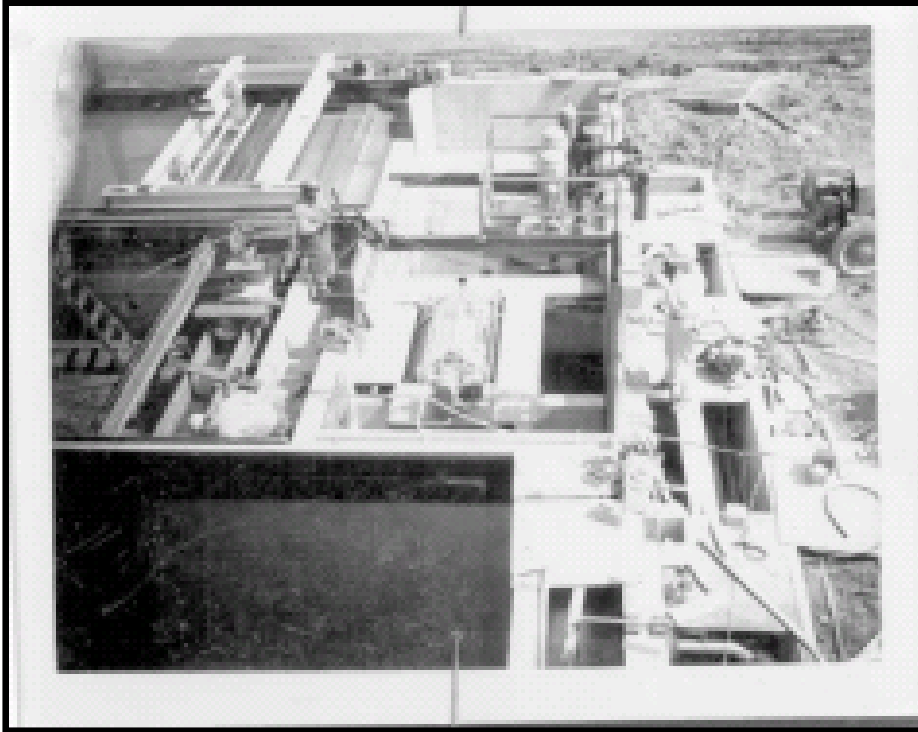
May 8, 1972 photo. View looking northwest from WWTP roof at new Micro screen and effluent discharge point (northeast corner of Oxidation tank). Pipe trench is present on the right-hand side.
